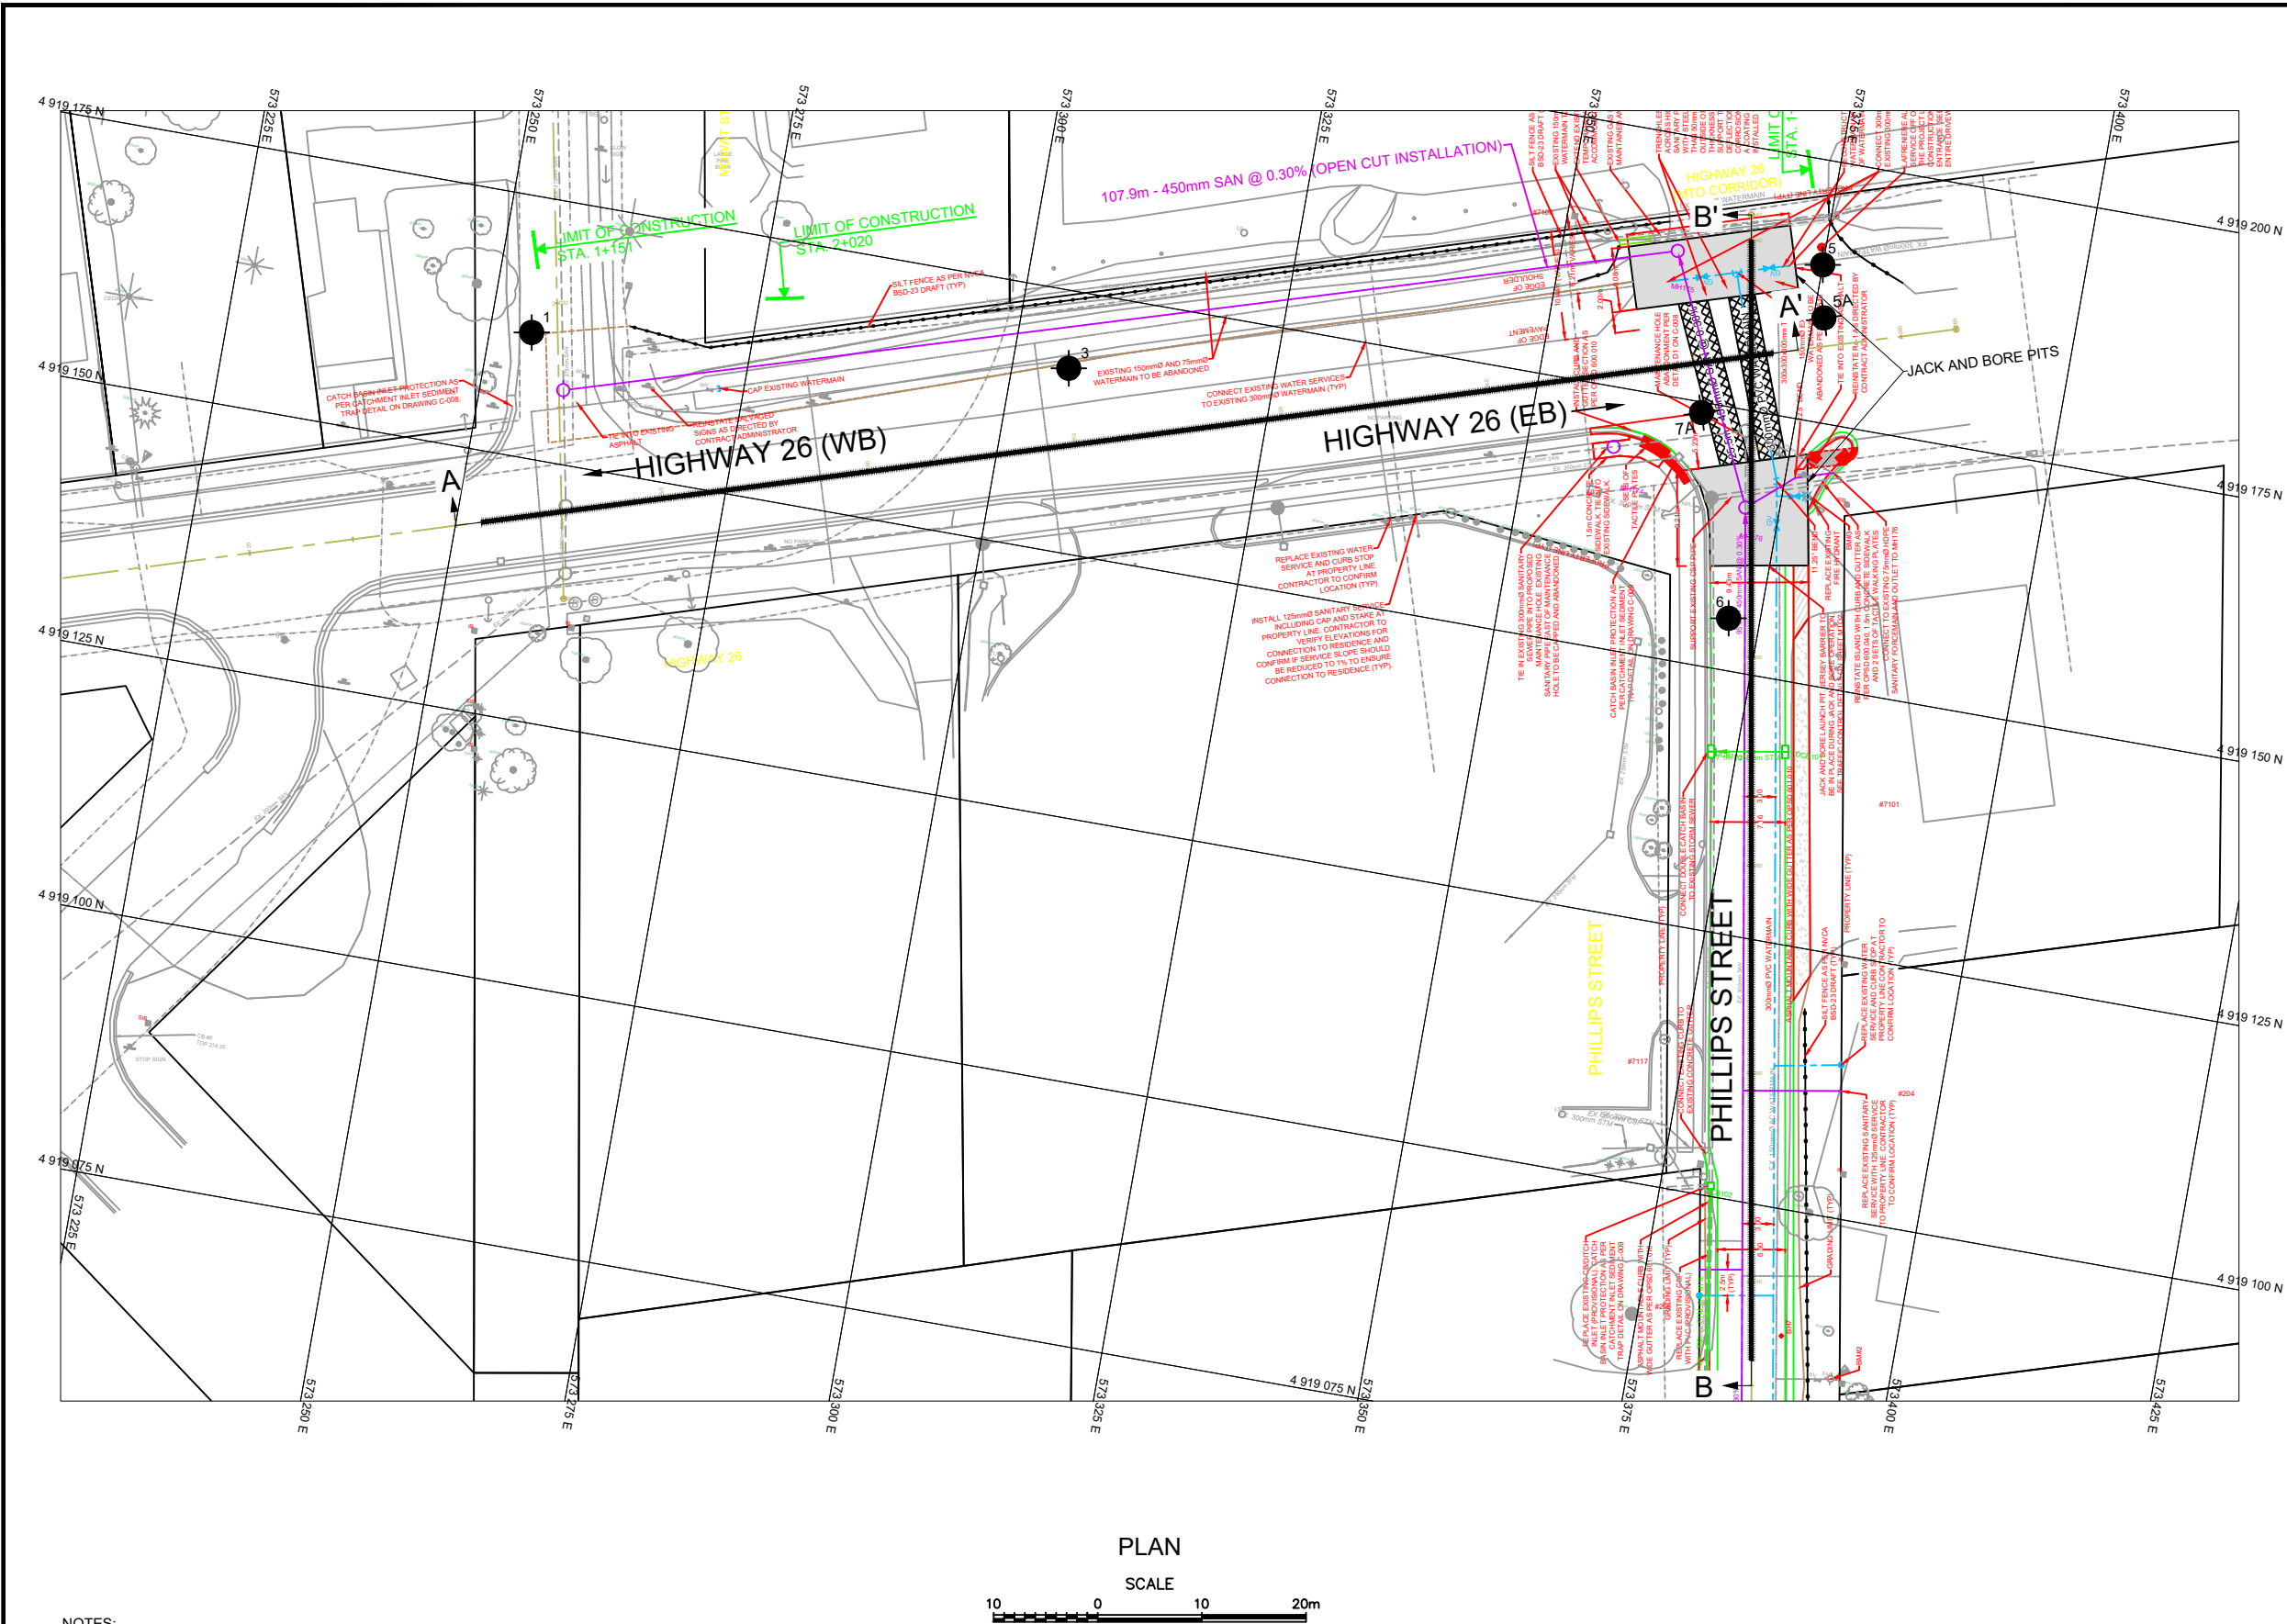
to 3 – Borehole Location Plan and Soil Strata
